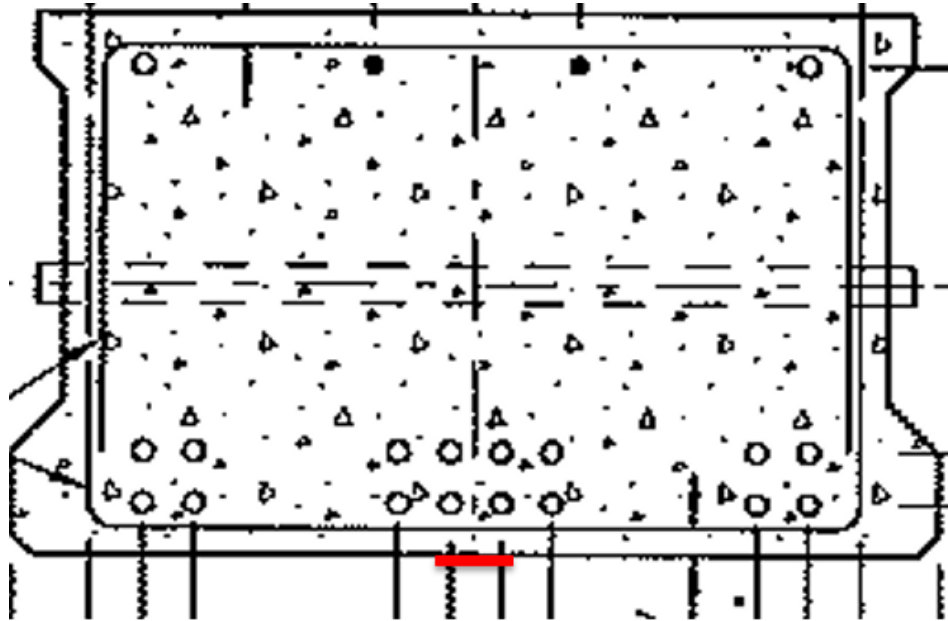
Schematic Drawing of Strain Gauge Mount Position on Solid Slab Girders 1 through 12
